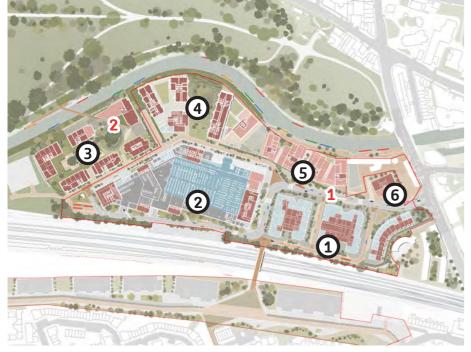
Base Masterplan - 13th April 2021 - Pre App Meeting - Joint Landowners Meeting
